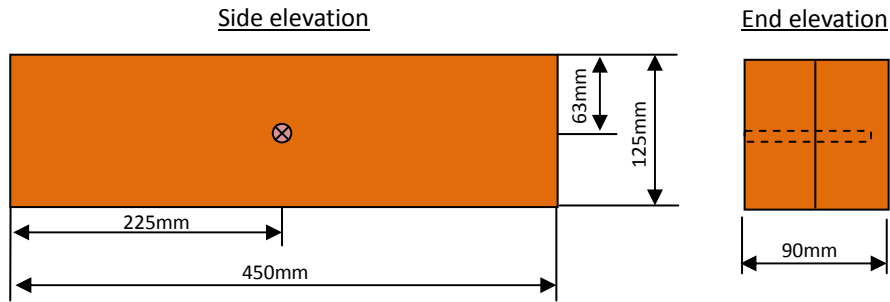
Nail layout for the small furnace test (NOT TO SCALE)
